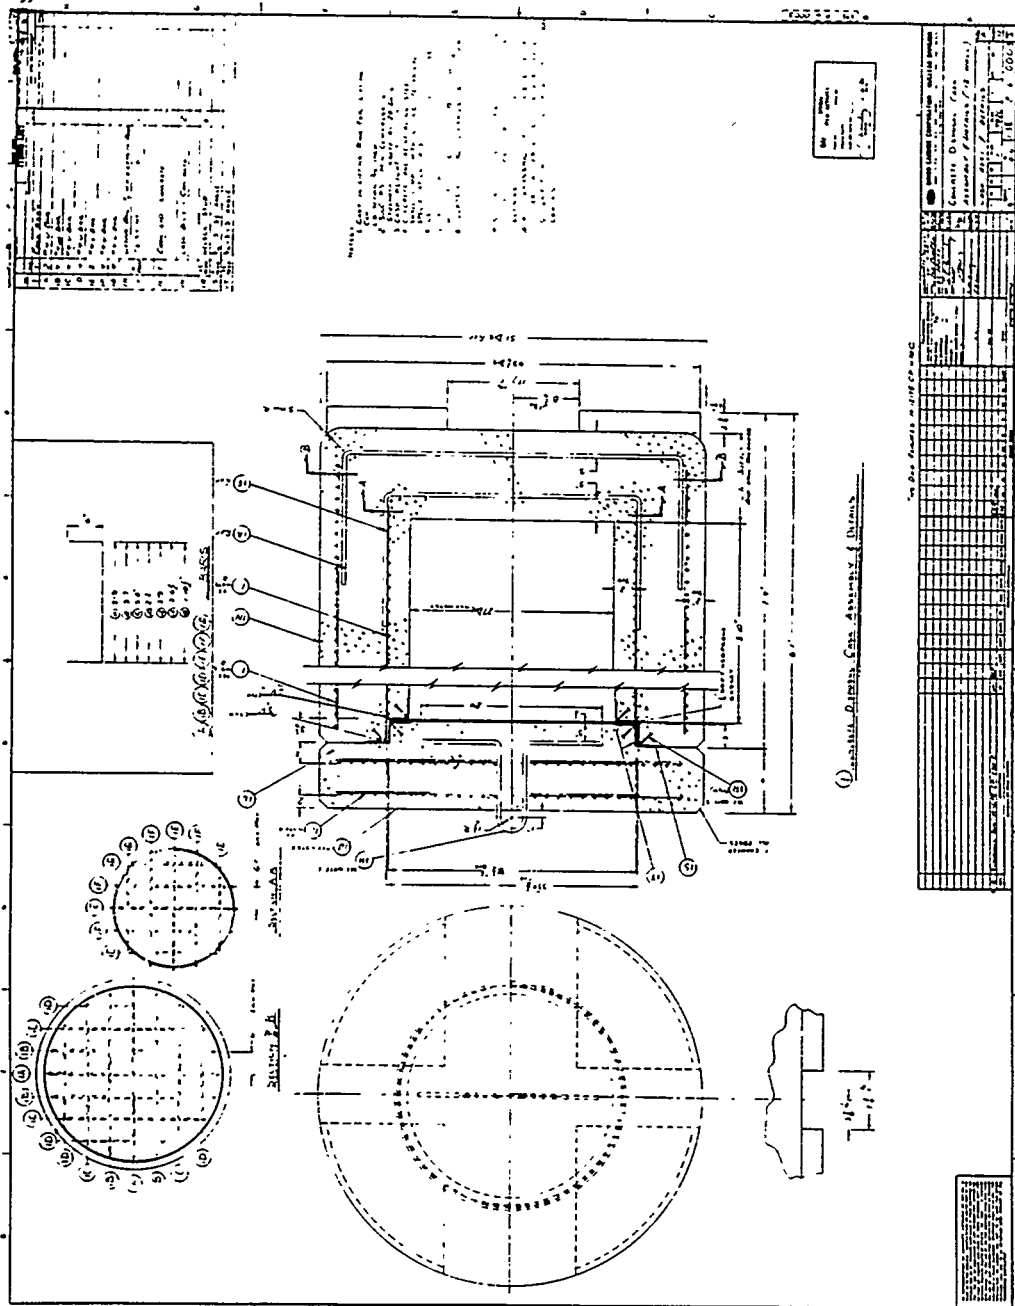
DETAILS OF CONCRETE CASK 0.305 METER THICK
